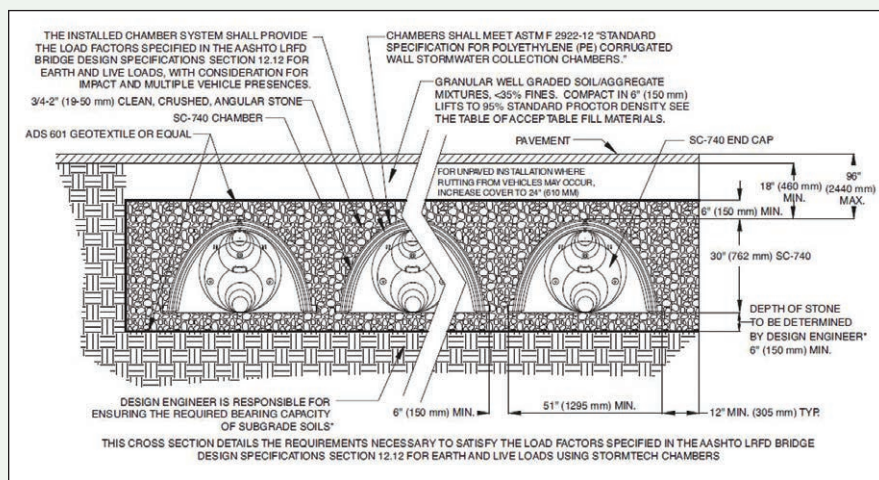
The schematic illustrates a typical installation showing a stone bed below the chambers, stone separating each row of chambers, and stone covering the chambers, with a parking lot surface of pavement and pavement subbase above that.
